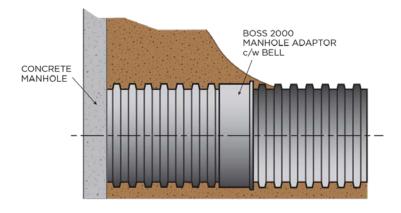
Detail of manhole adaptor connection for existing manhole structure
